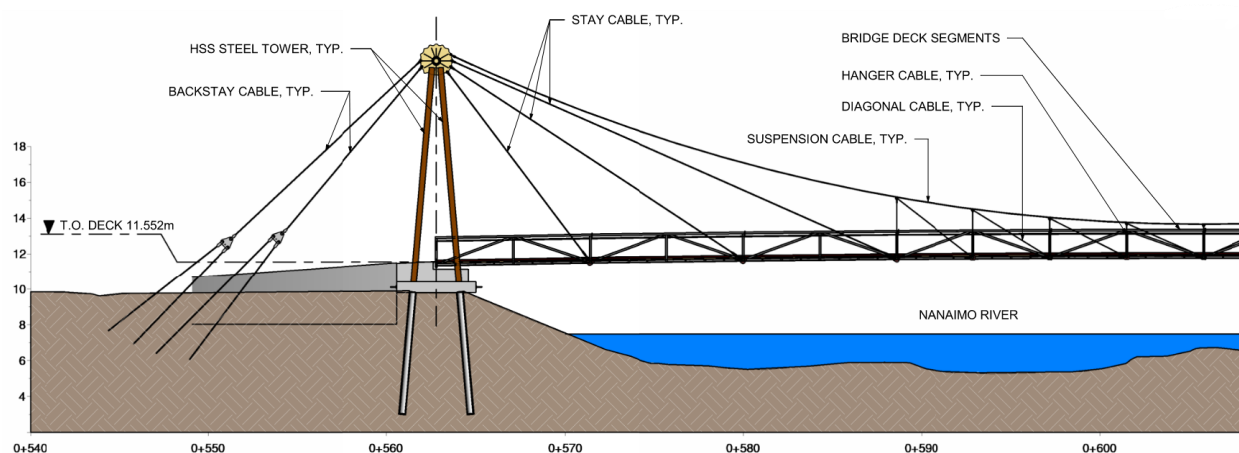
Hybrid cable-supported arrangement showing stay cables, main suspension cable, and hanger cables.
